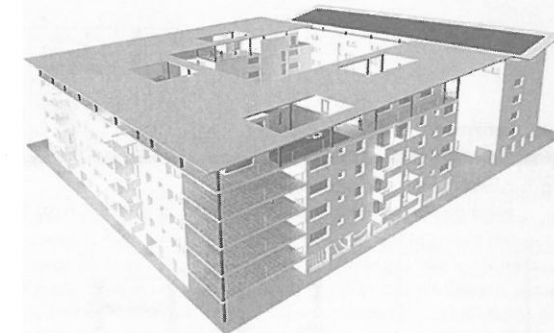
Roof plan extension, Ater building in vicolo Pineta, Mestre, Venice
